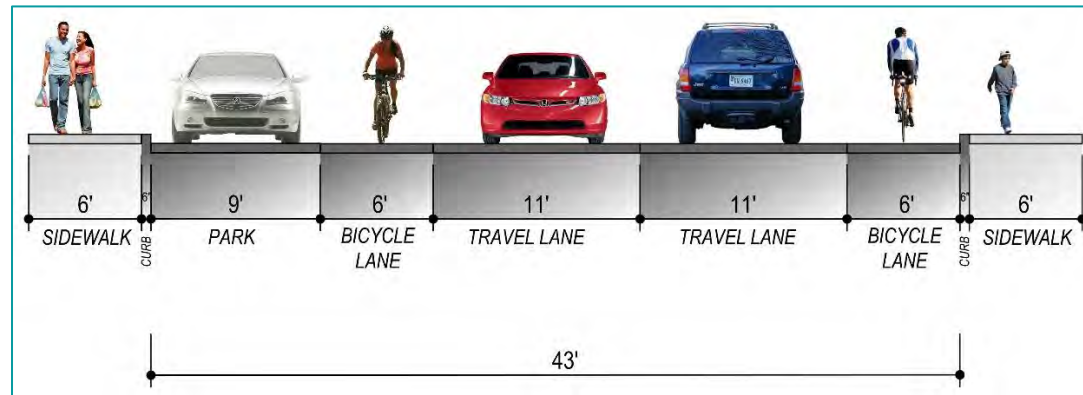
Preferred Alternative: Section B – E. Market Street between 8th Street and 9th Street
